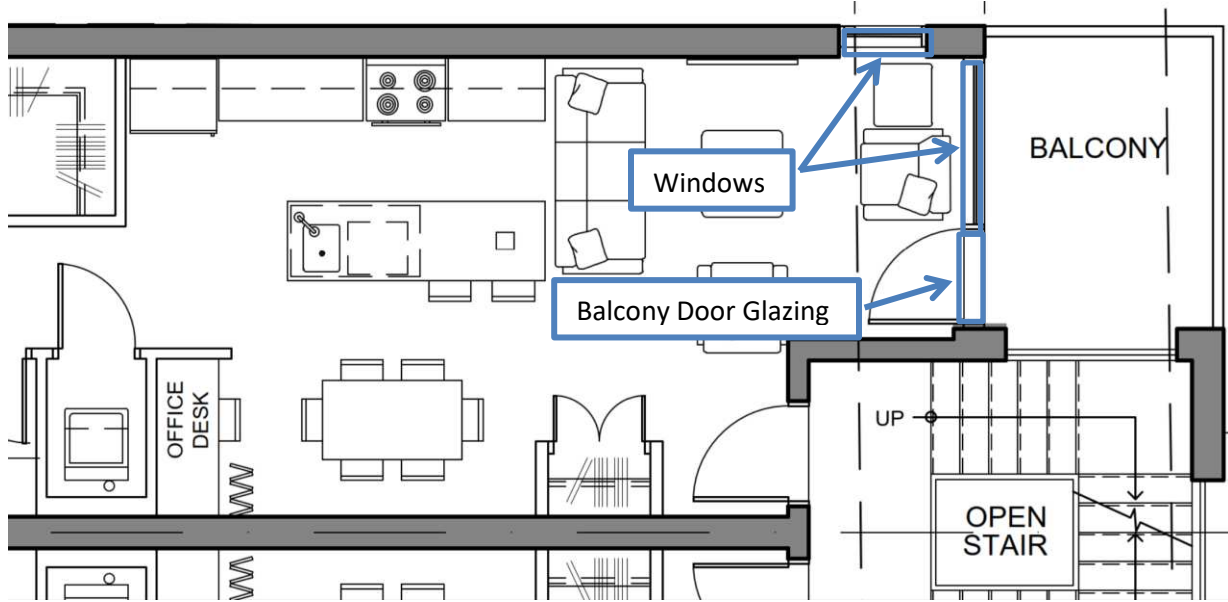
Layout of living area in ground floor and 3rd floor unit used for analysis of POR1 and POR3 for Block A. Exterior wall assembly equivalent to CMHC wall type EW2.
